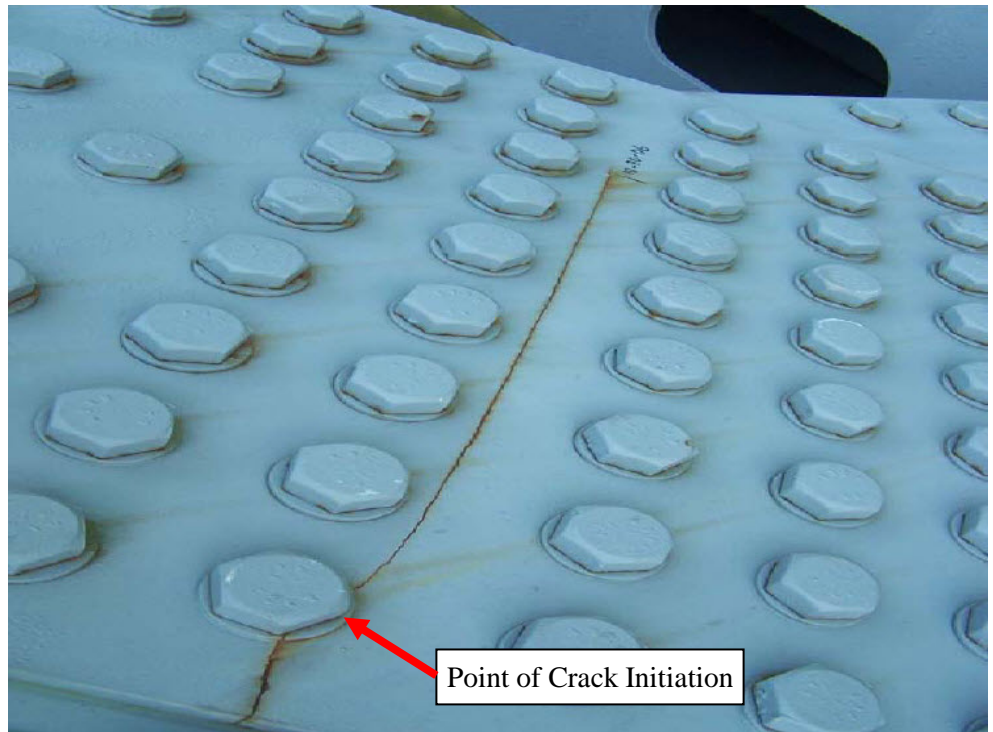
Cracked Gusset Plate and Point of Crack Initiation
